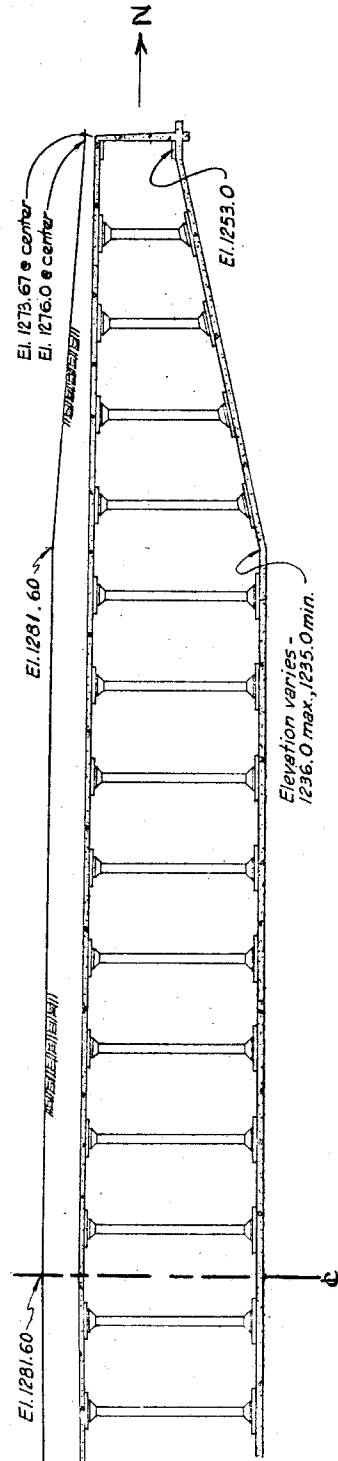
Section through reservoir. Spirally reinforced, 24" diameter concrete columns at 20' on centers both ways.
